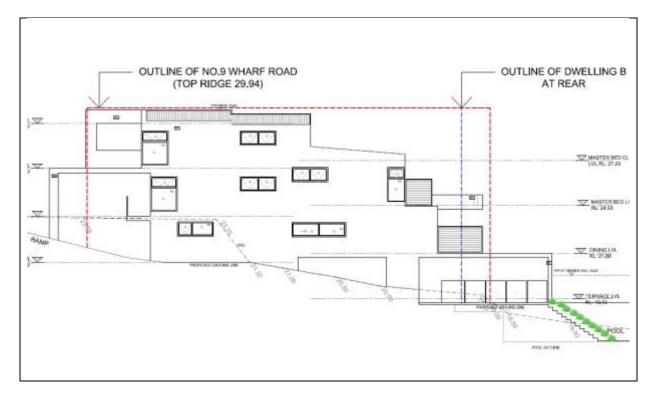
Outline of Dwelling B (Southern Side) in respect to 9 Wharf Road
